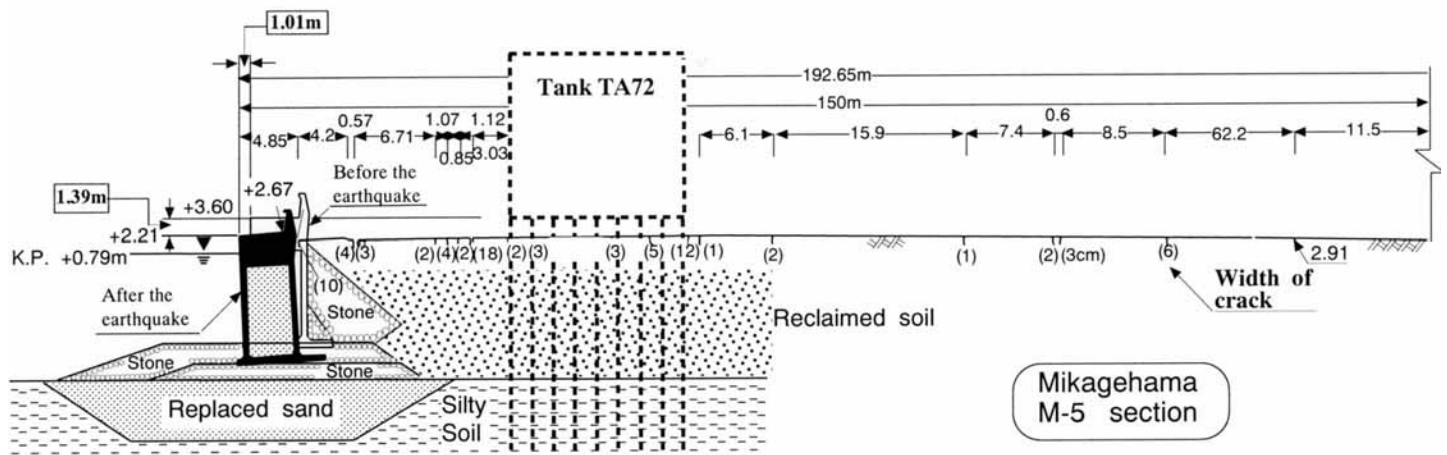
Detailed profile of the quay wall movement and ground distortion in the backfills at Section M-5
